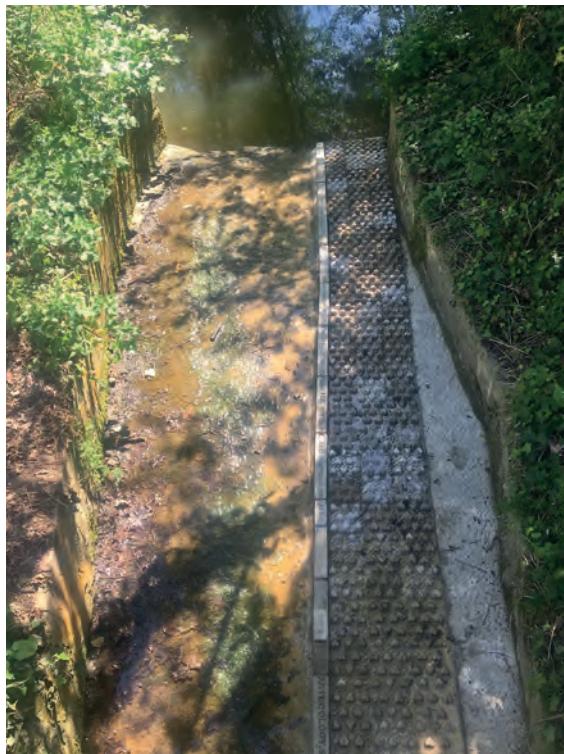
Elevator pavement with dimpled backwater section for plant colonisation
